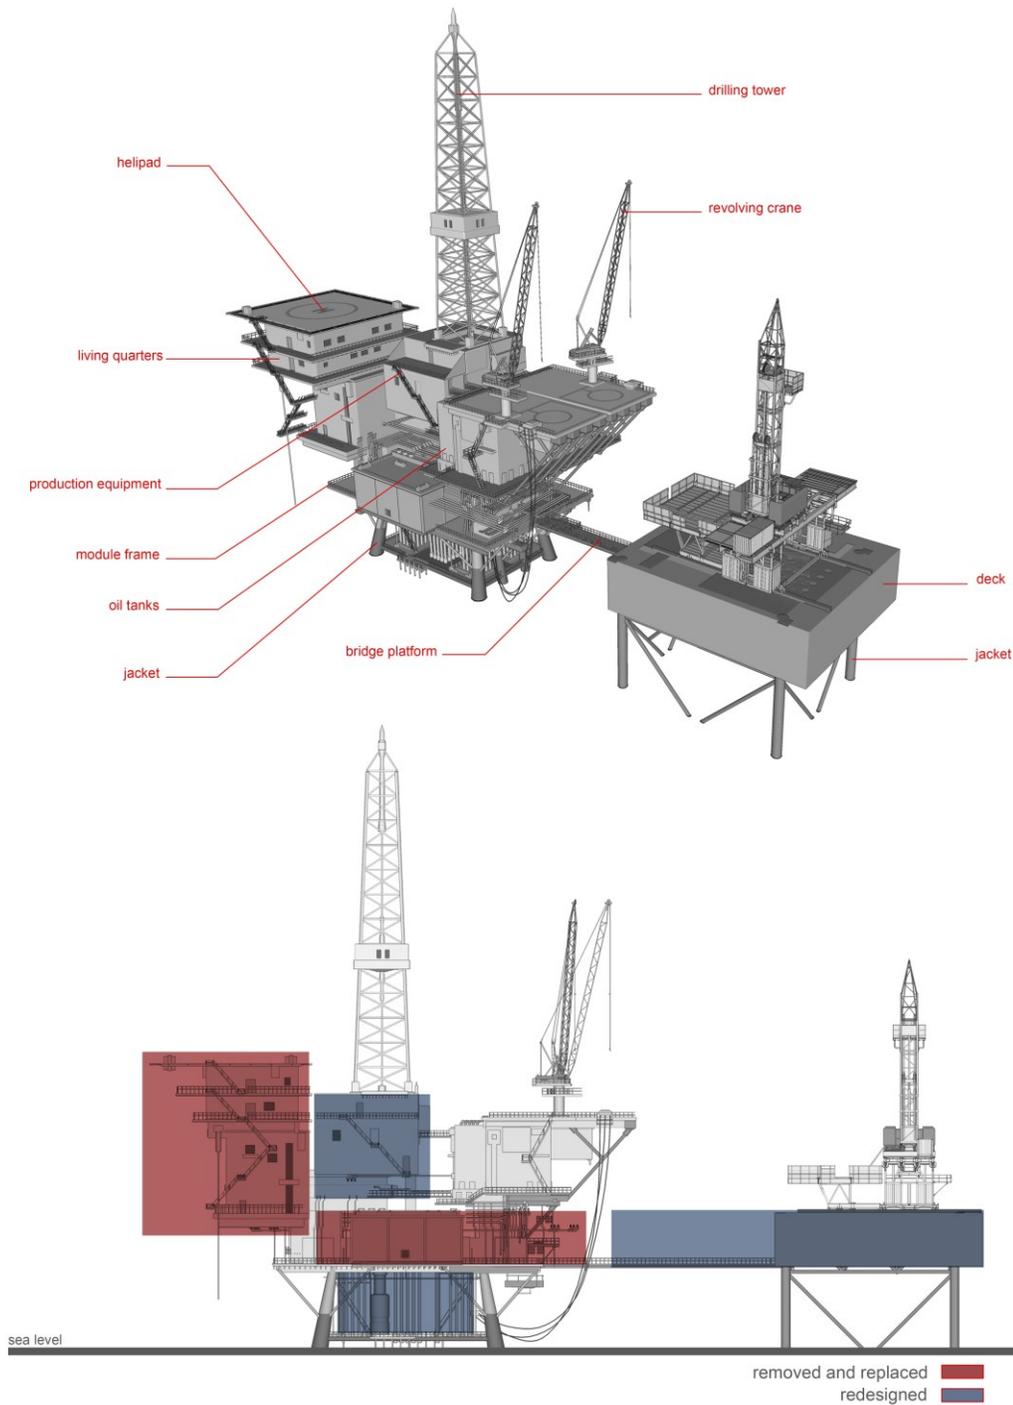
unwanted sections of the existing platform are removed. The deck and the jacket (structure of the platform) will remain untouched to make basis for the newly designed section to be installed.
